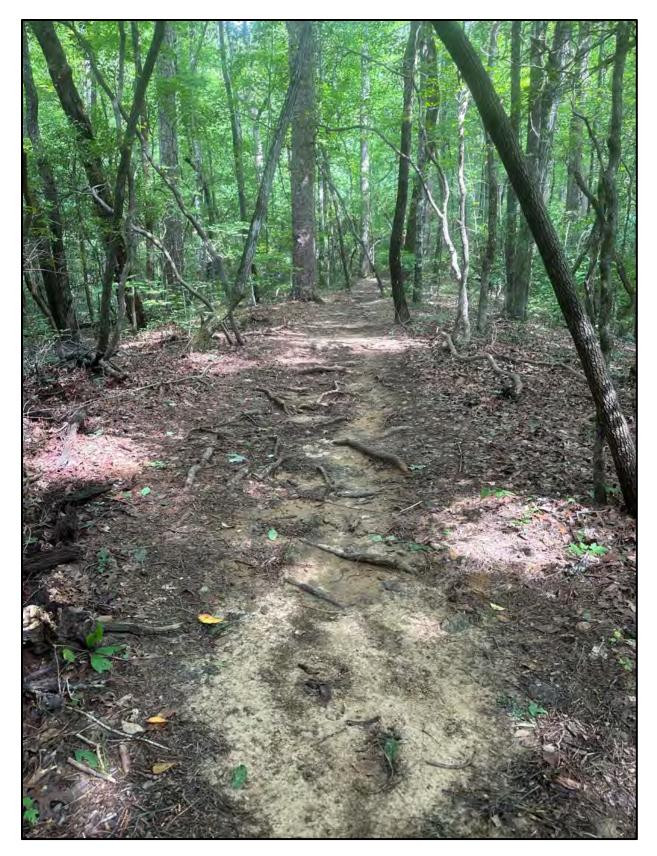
Trail Issue #15 – Foothills Trail, Washout (see Figure 4.3)
